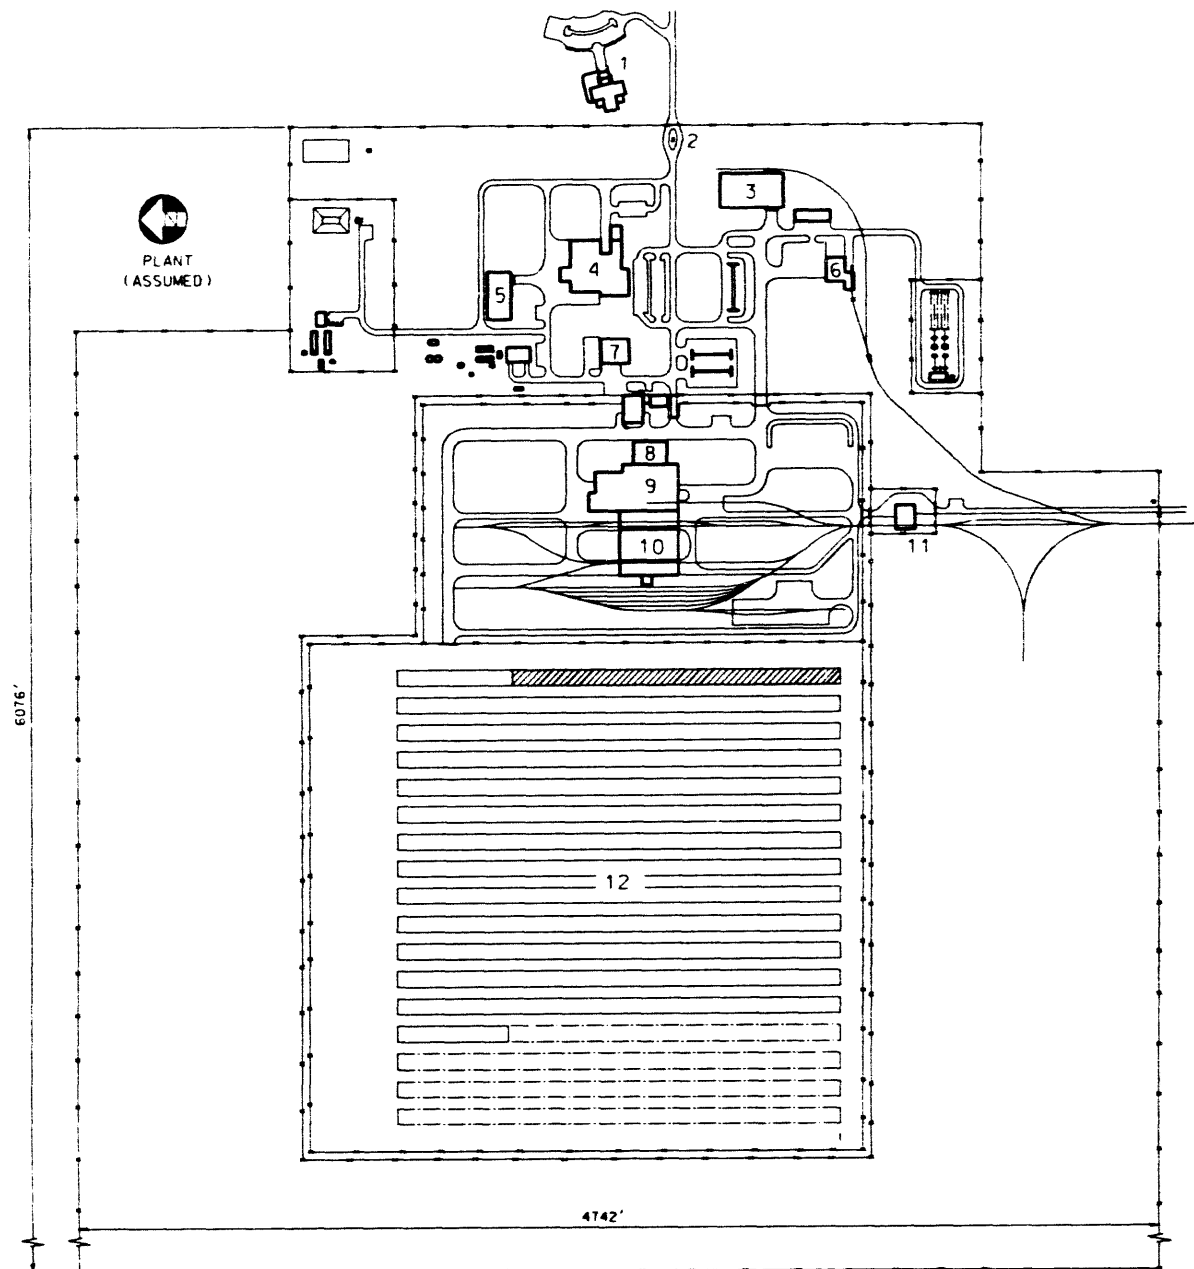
General Arrangement Plan of MRS/MPC Facility including Dry Storage Area
